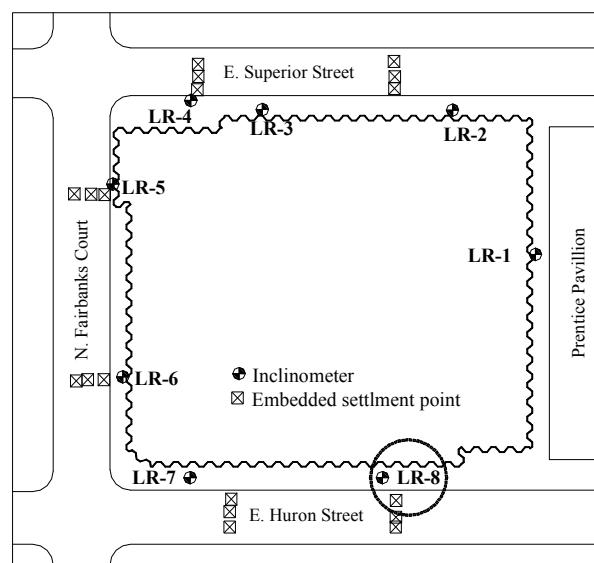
Plan view of the Lurie Center excavation (Modified from Finno and Calvello 2005)
